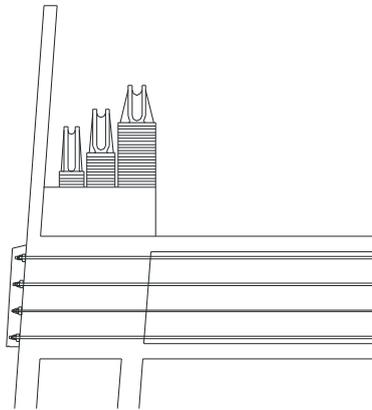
Strengthening of the transverse top beam of the towers
